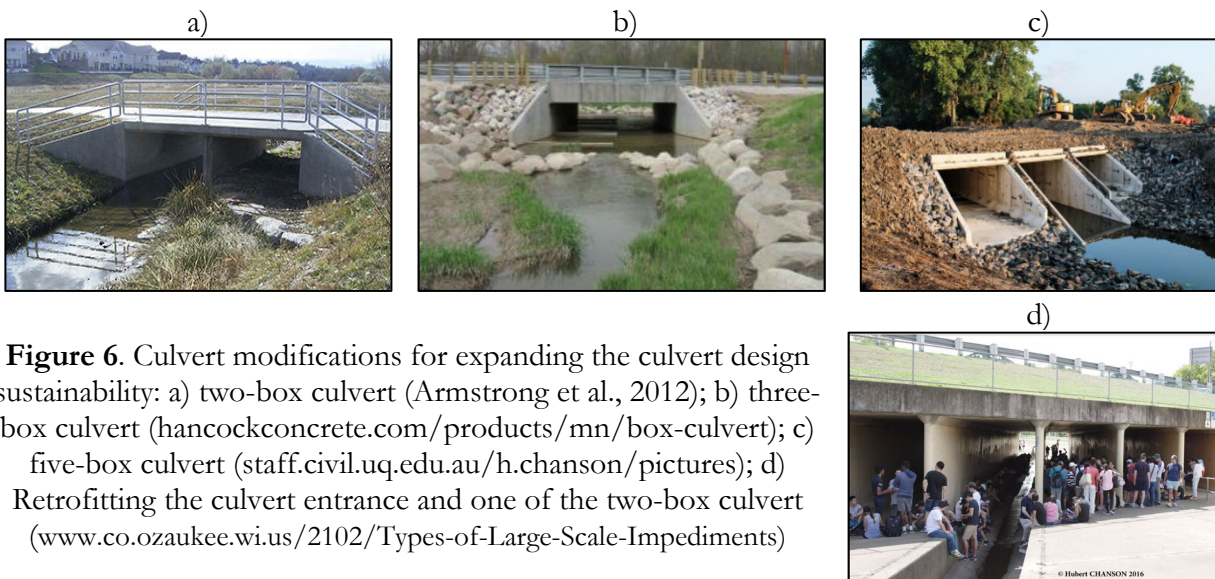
Culvert modifications for expanding the culvert design sustainability: a) two-box culvert (Armstrong et al., 2012); b) three-box culvert (hancockconcrete.com/products/mn/box-culvert); c) five-box culvert (staff.civil.uq.edu.au/h.chanson/pictures); d) Retrofitting the culvert entrance and one of the two-box culvert (www.co.ozaukee.wi.us/2102/Types-of-Large-Scale-Impediments)
